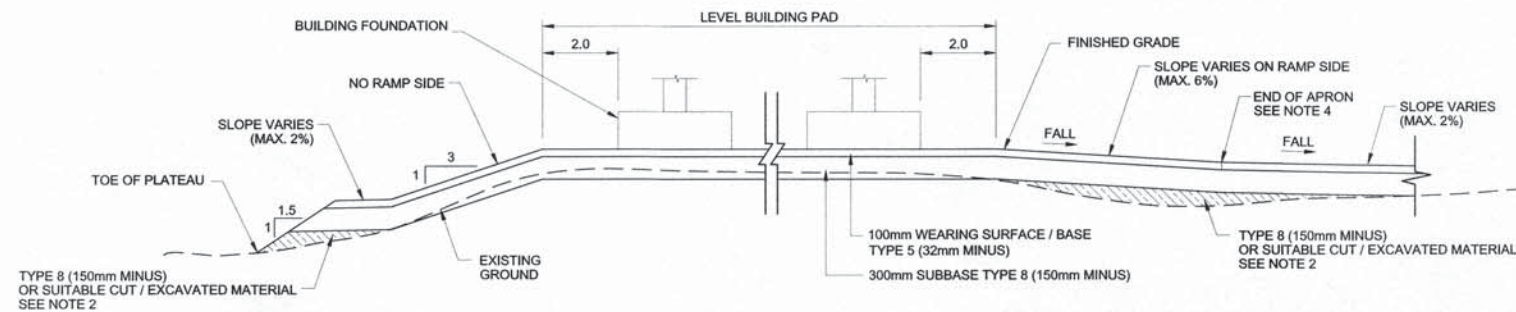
TYPICAL EARTHWORKS FOR FINISHED GRADING
